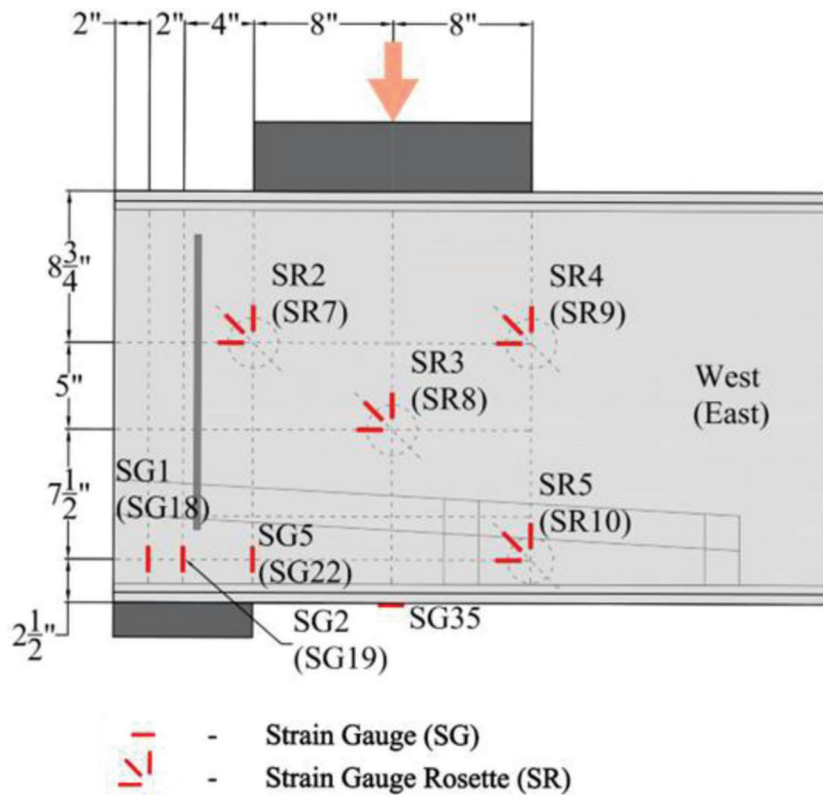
Strain gauge layout (side elevation): Specimens 3, 6, and 7.
